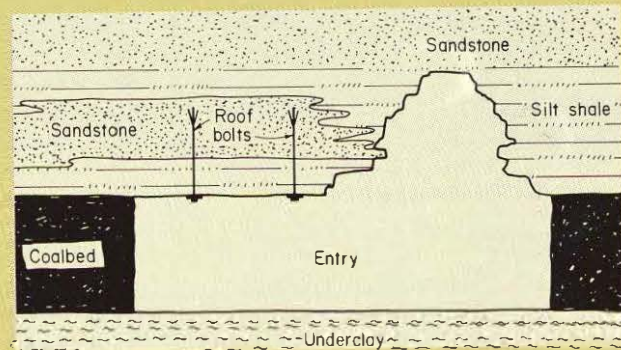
Subtype G₄ roof failure attributed to pinchouts.
